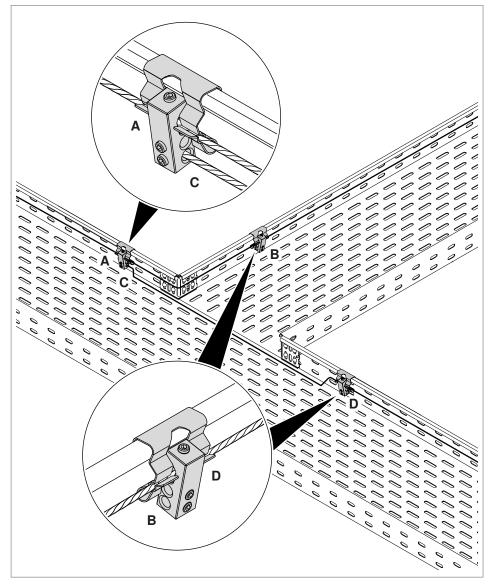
MKS, mounting of conductor cable branch, single connection terminal
